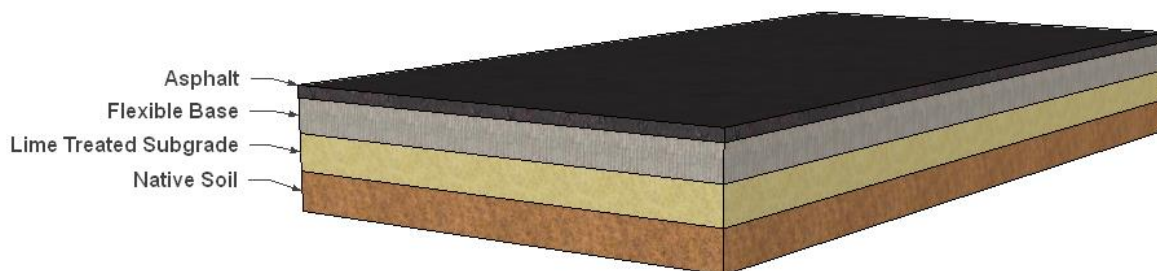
Option 1 Flexible Pavement Typical Section
